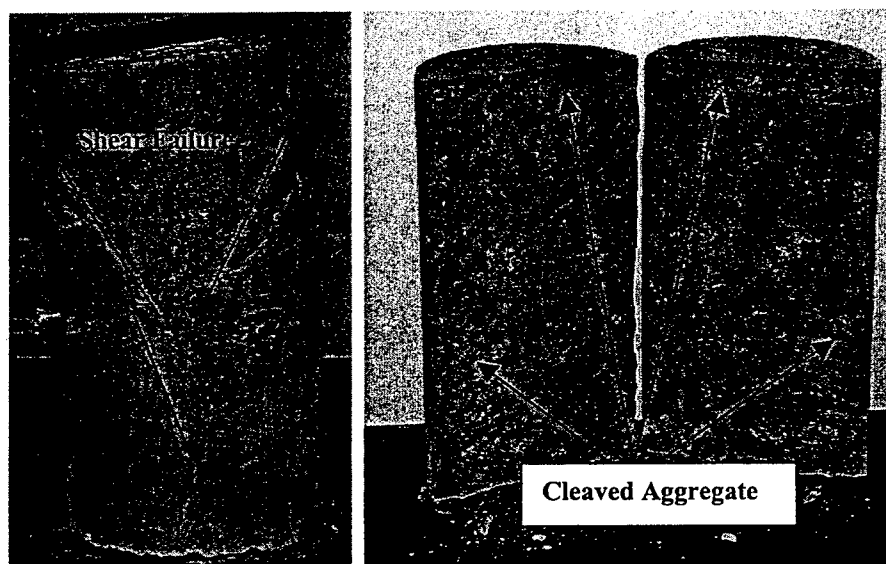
Failure modes of cenosphere concrete after the addition of silica fume. On the left, a compressive specimen showing shear failure, and a tensile specimen showing cleaved aggregate and no “pop out”.
